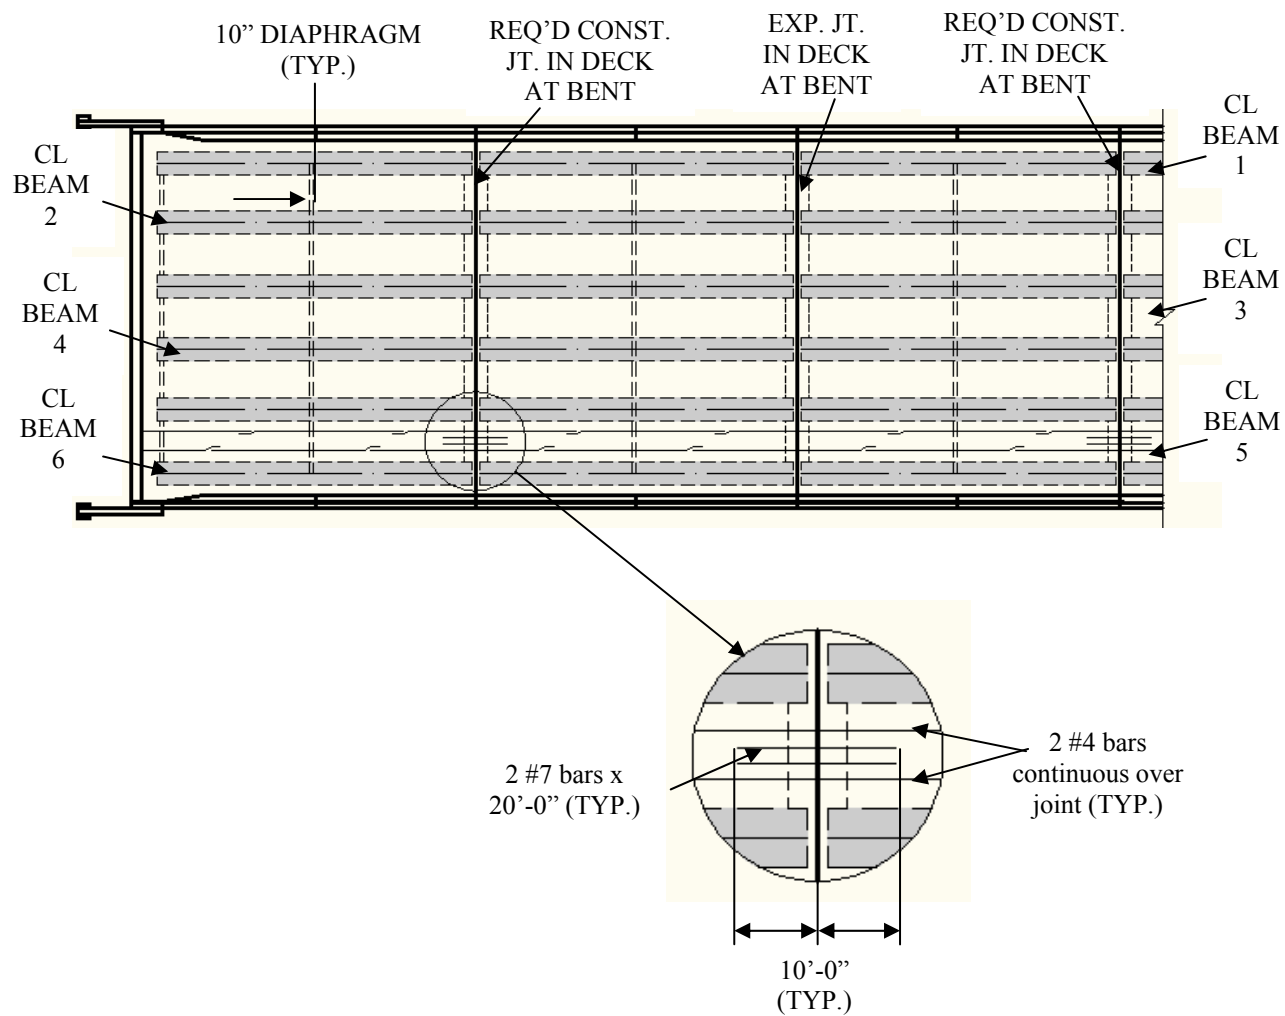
Plan view of continuous bridge deck with #7 and #4 longitudinal reinforcement bars circa 1987 (modified from GDOT SR 46 Over Oconee R. plan)
